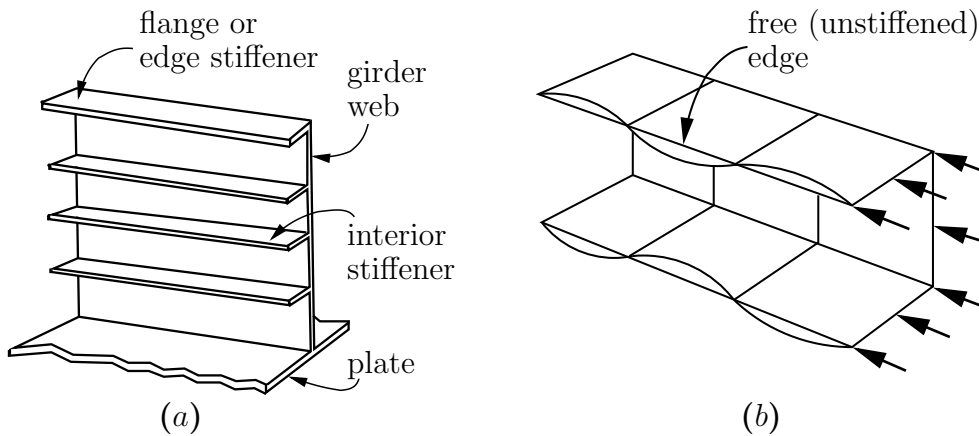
(a) Section of a typical stiffened girder with an edge provided with a stiffener, and (b) a free edge example of a flange outstand of a channel beam.
